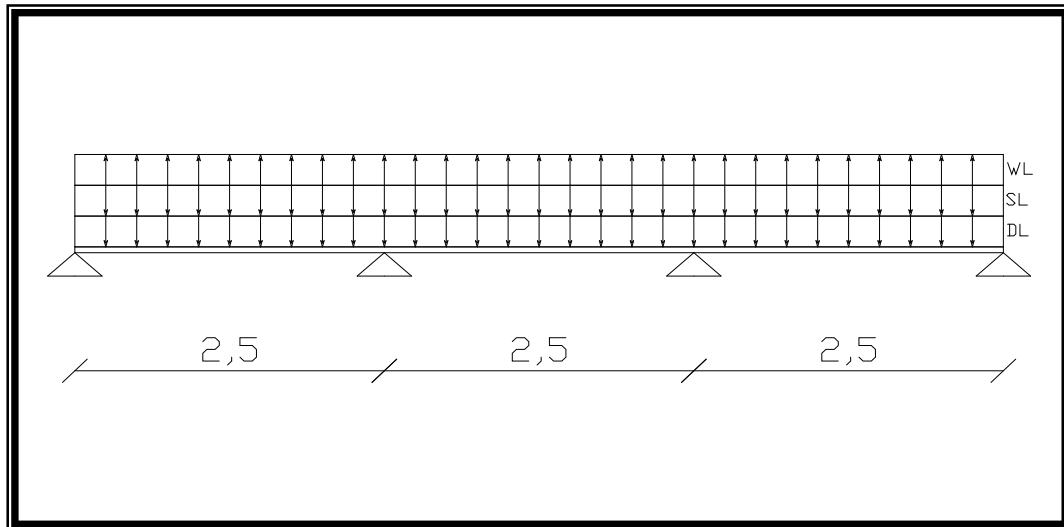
1): system of loads for corrugated roofing sheets (CS.1).
